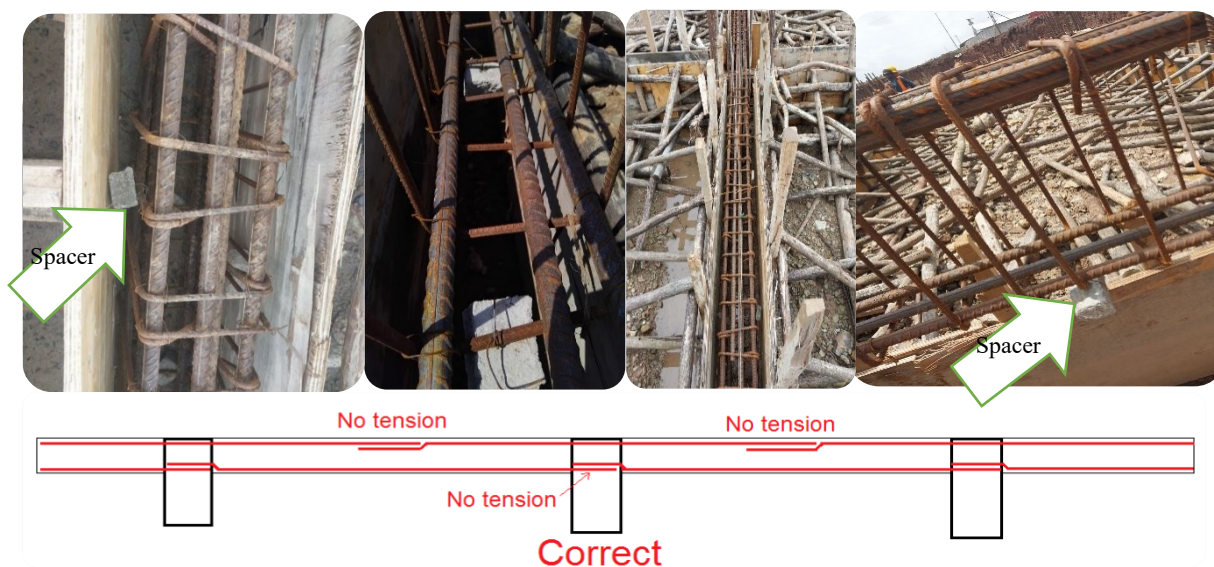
Main Bar and Splice Locations for Continuous Basement Beams (closer stirrup at lapping).
